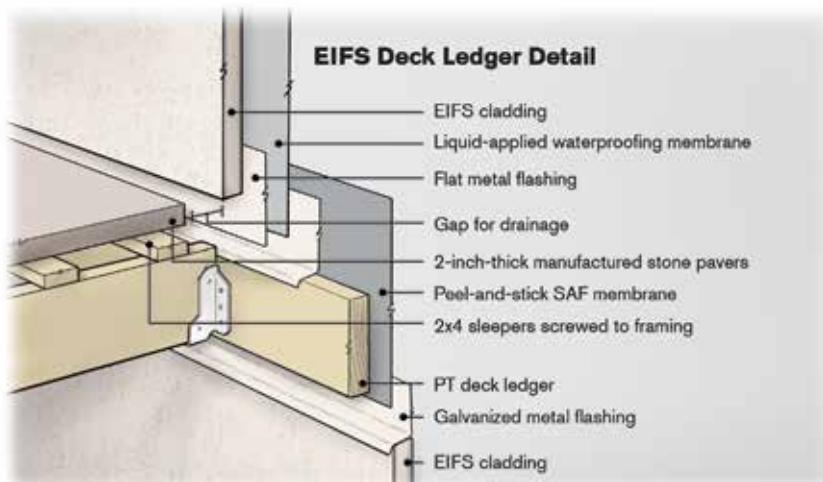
Before installing the new ledger, workers installed new metal flashing over the EIFS, and an SAF membrane over the sheathing.
